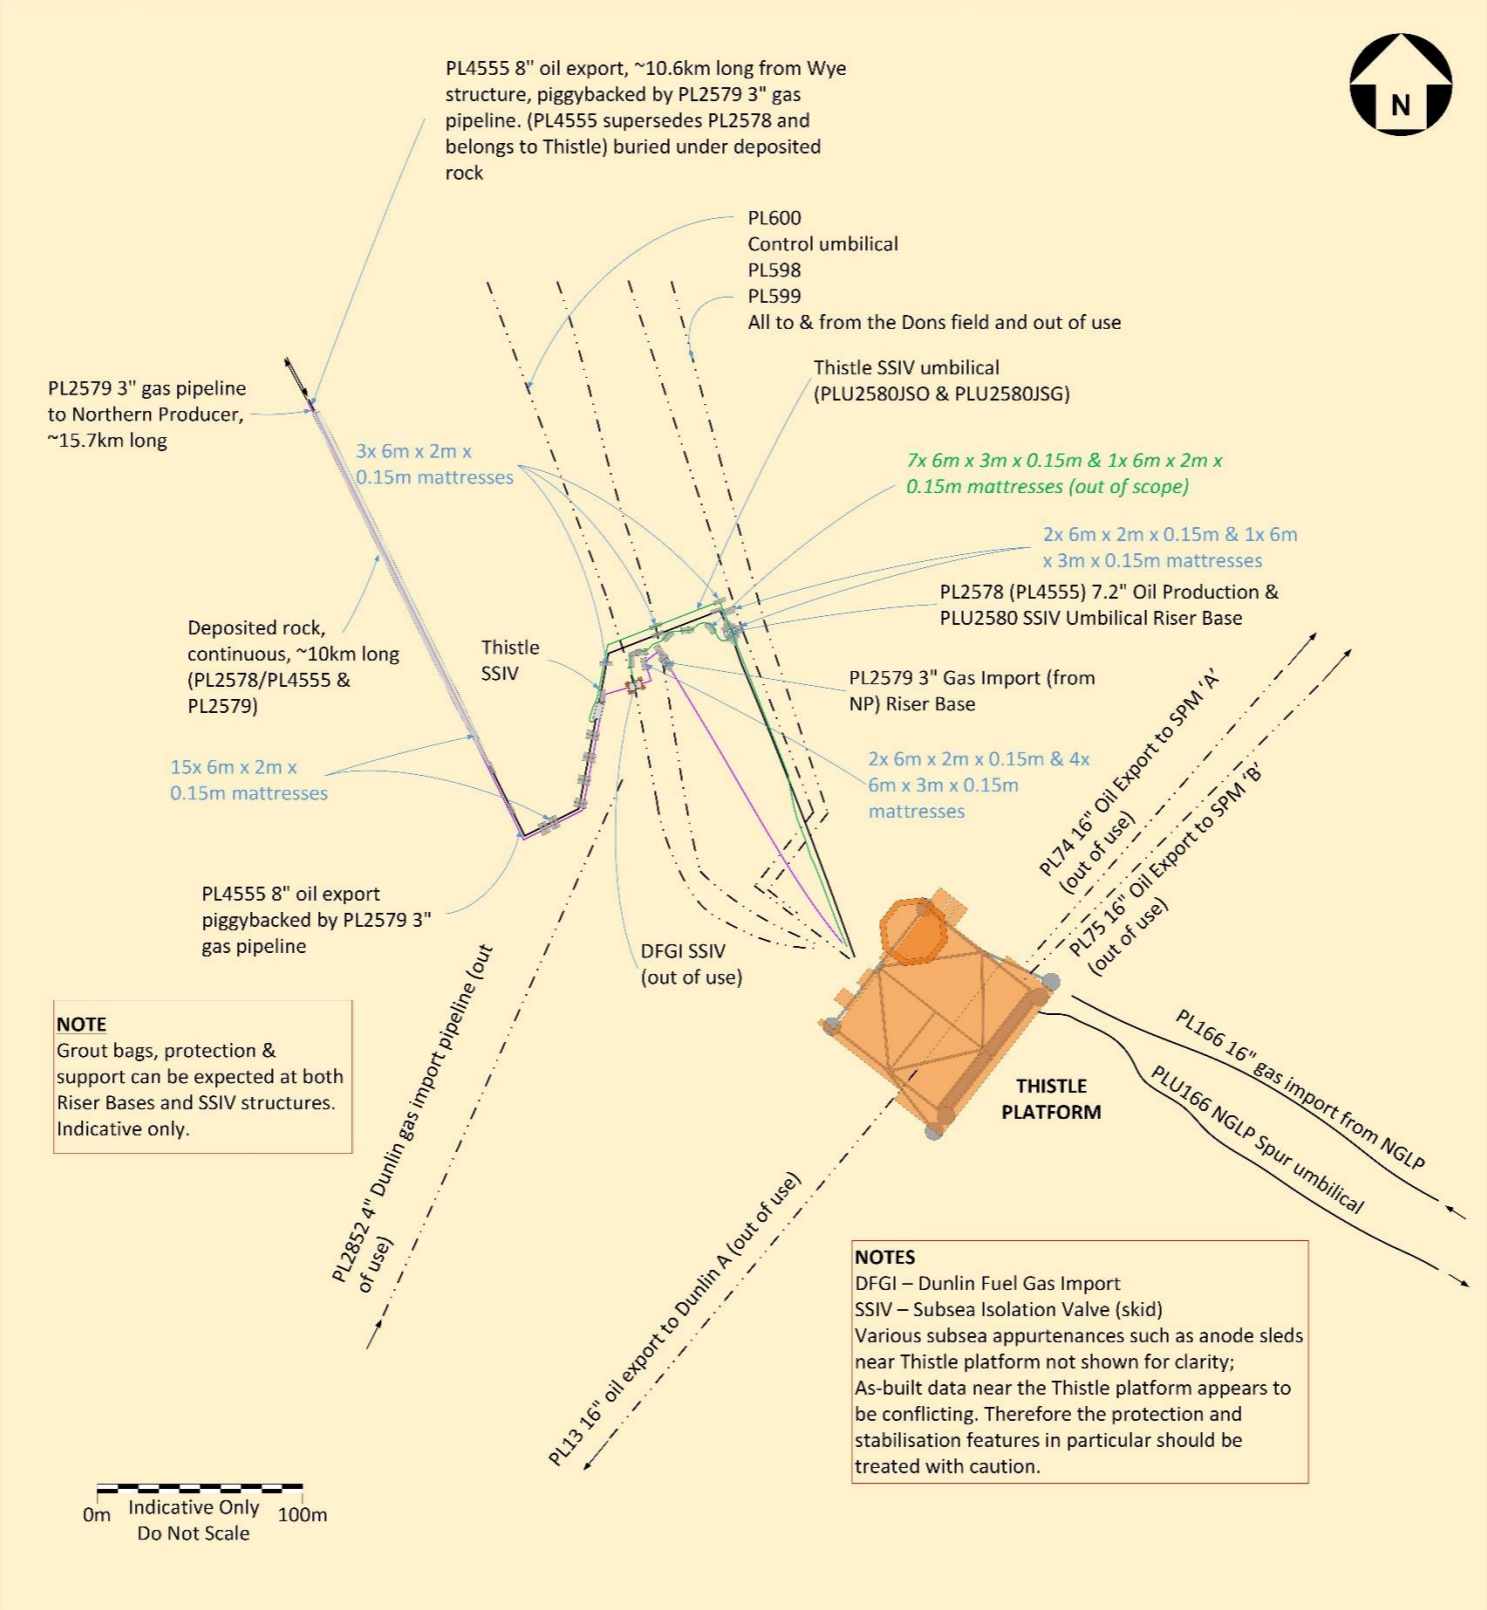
Layout Showing Approaches to Thistle ‘A’²
